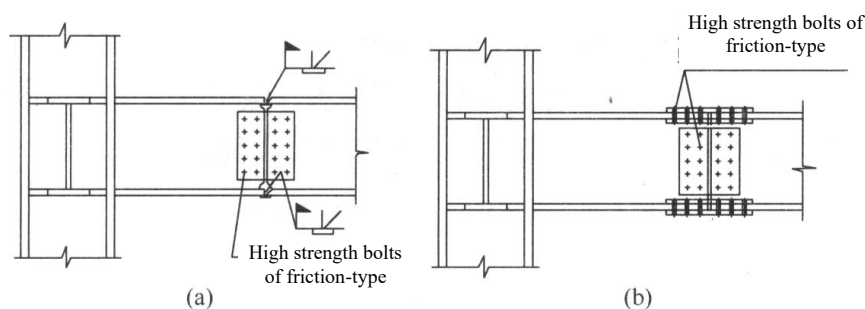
Connection of Frame Column and Cantilever Section of Beam
